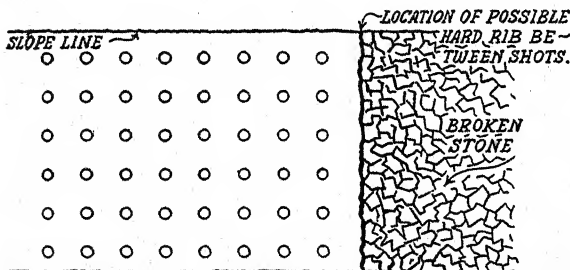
Typical drilling layout for blasting rock for a thorough cut
